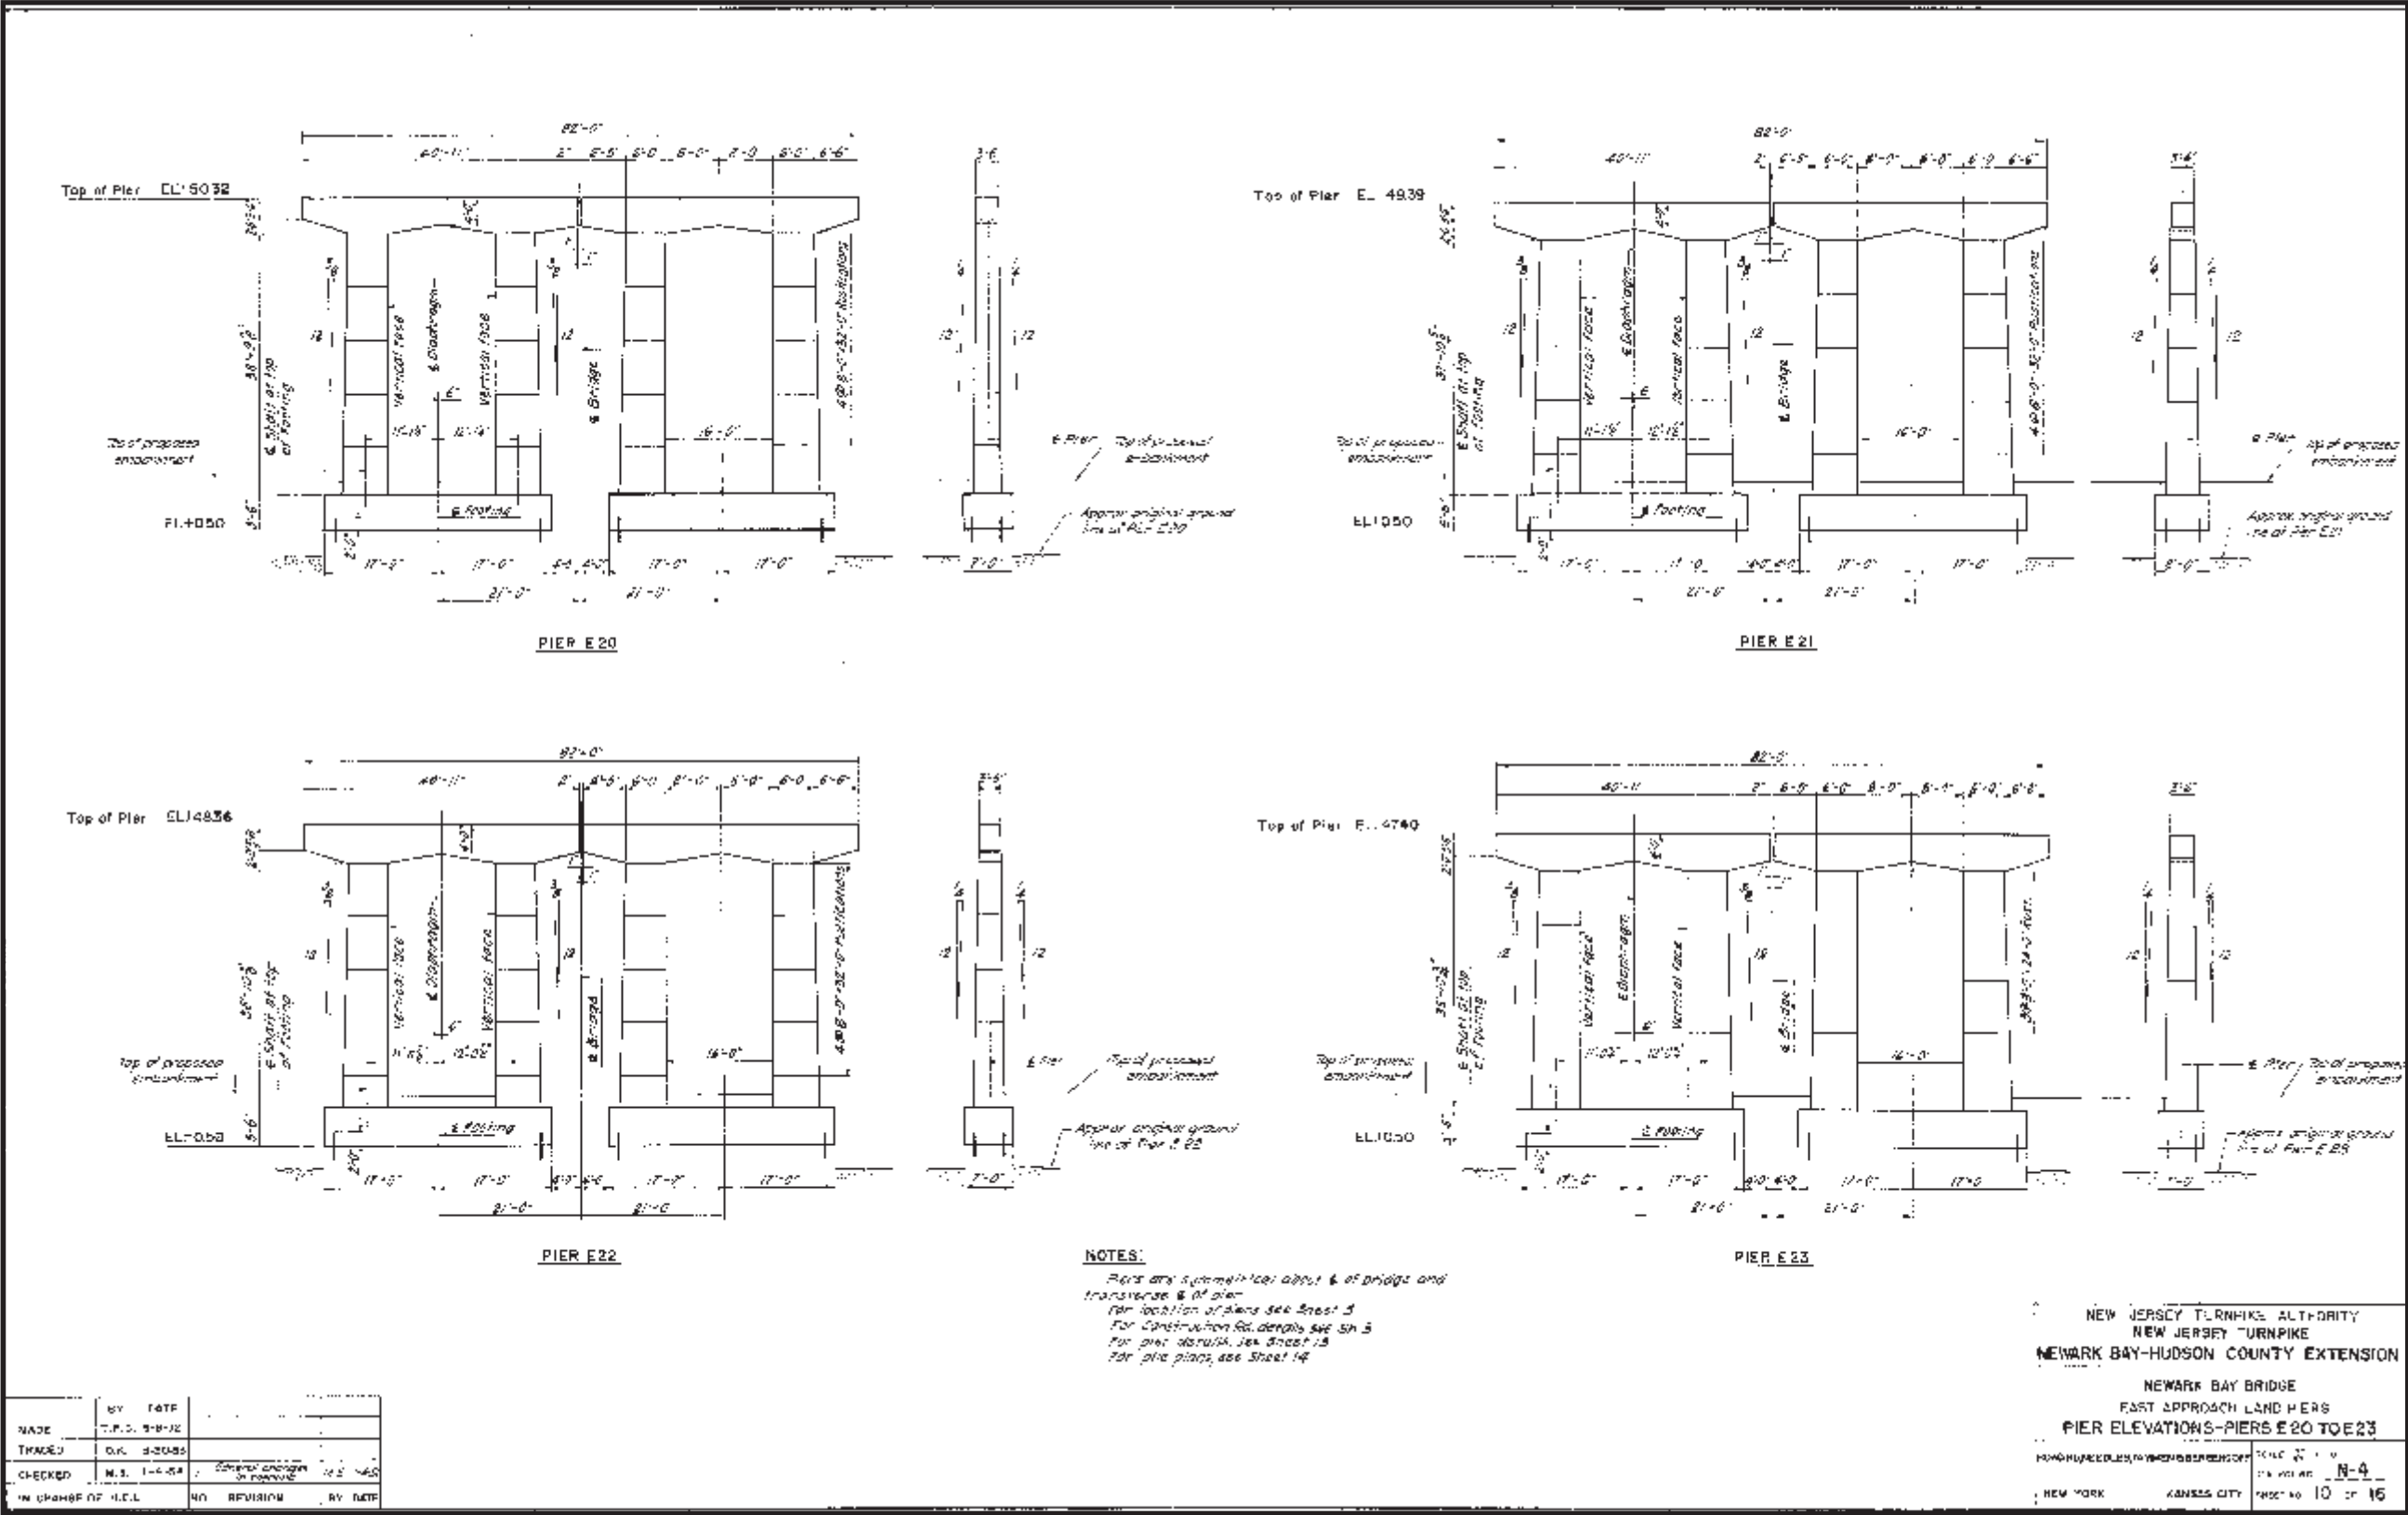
1952 drawing of the Newark Bay Bridge depicting typical land piers supporting beam spans on the east approach (HNTB 1952f).
